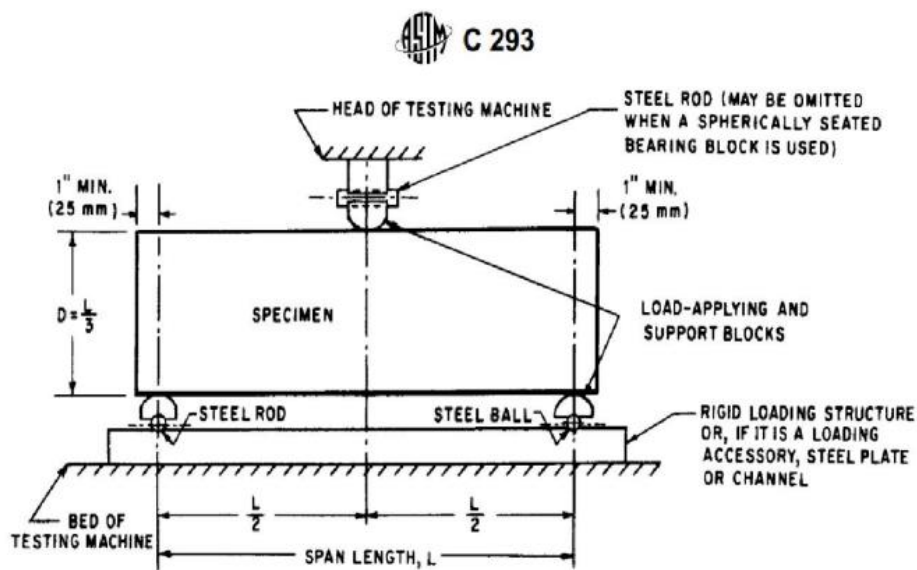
10 Flexural testing Assembly (ASTM-C293)
